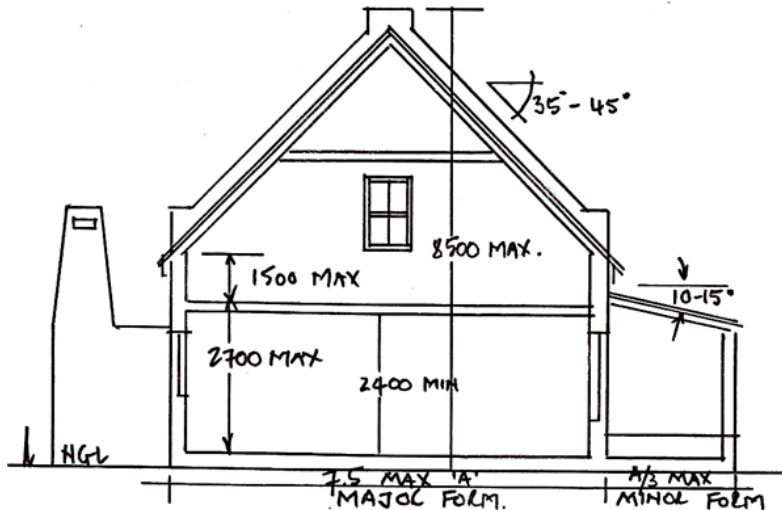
BUILDING HEIGHT & ROOF PITCH
